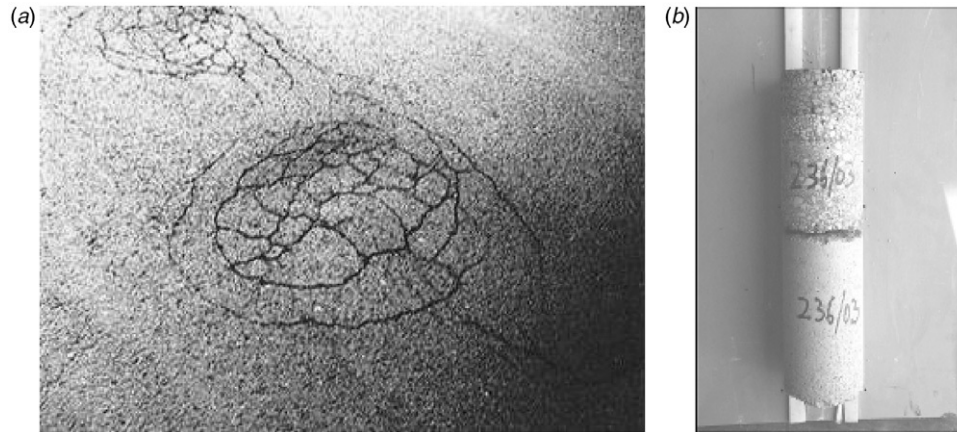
Local pavement surface emergent cracking (left) probably due to debonding (right).
